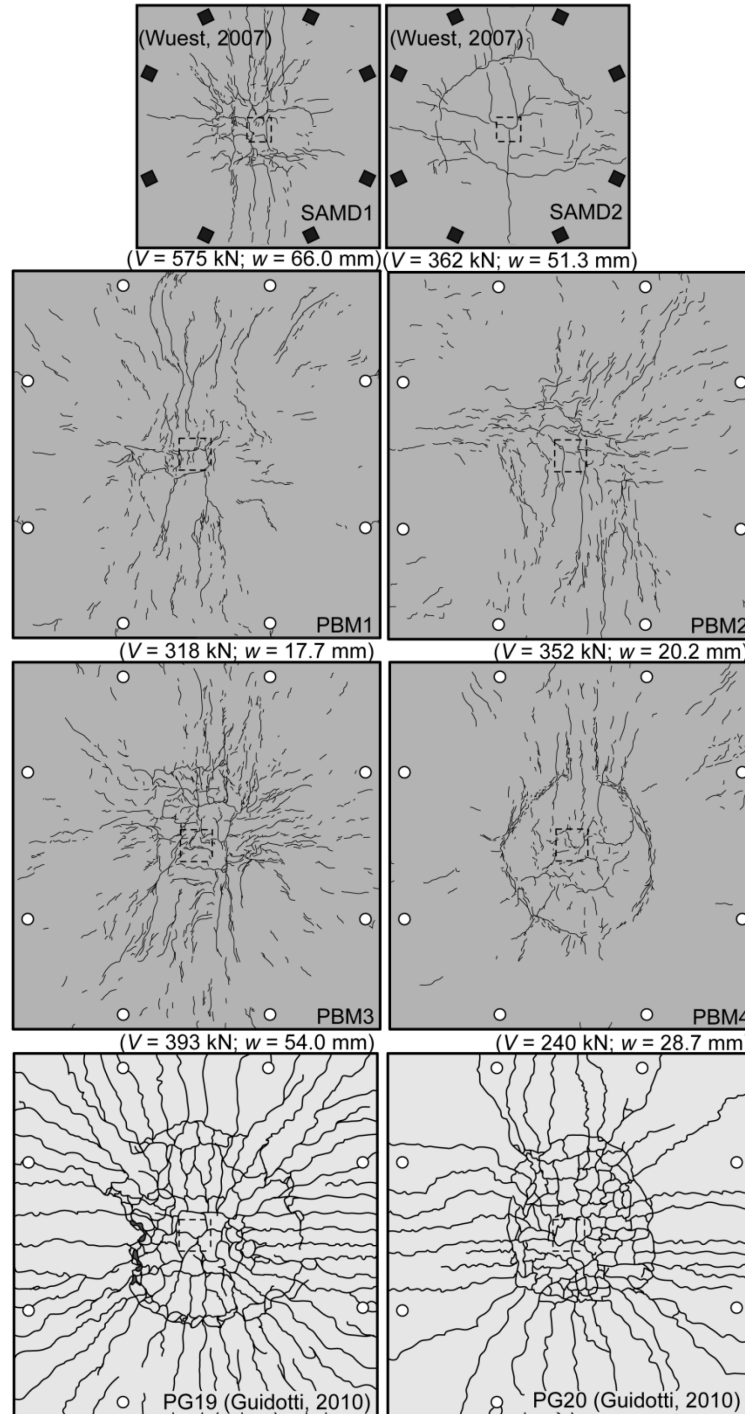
Fully developed cracking pattern of the top tensile faces at the end of the tests
